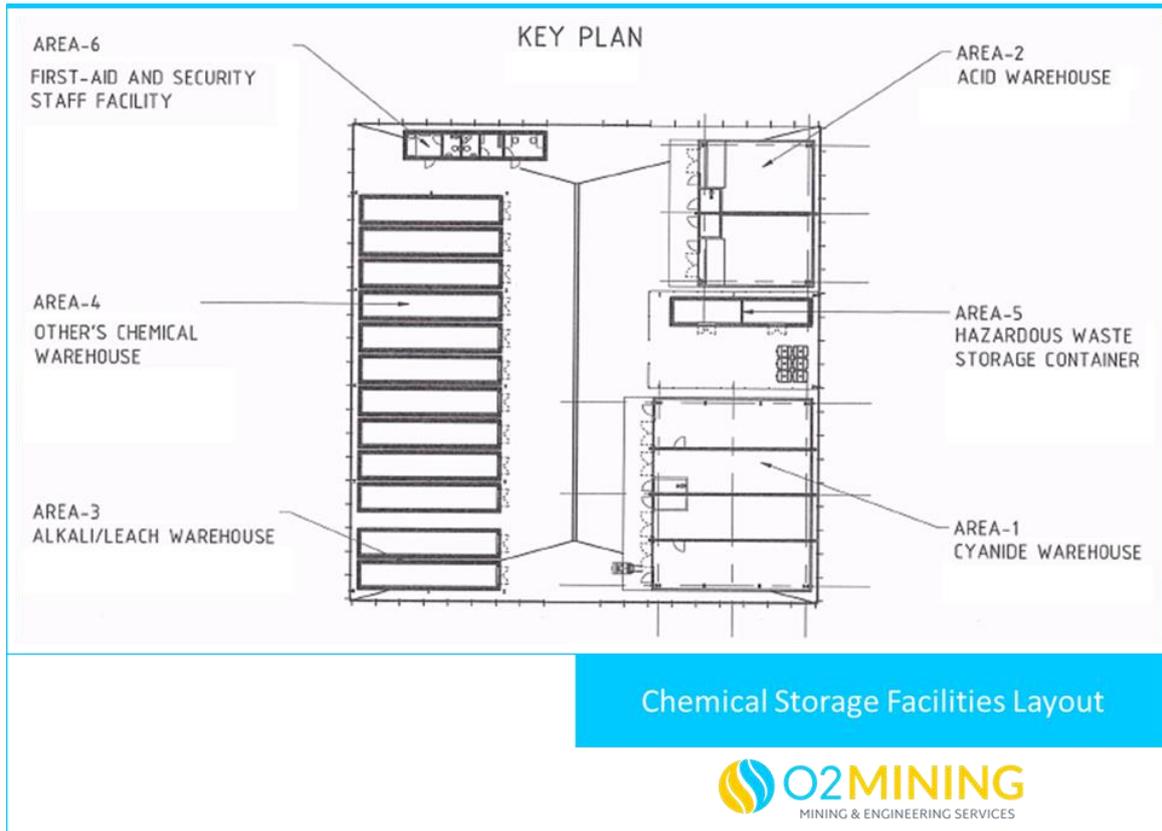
Chemical Storage Facilities Layout (Source O2 2023)
